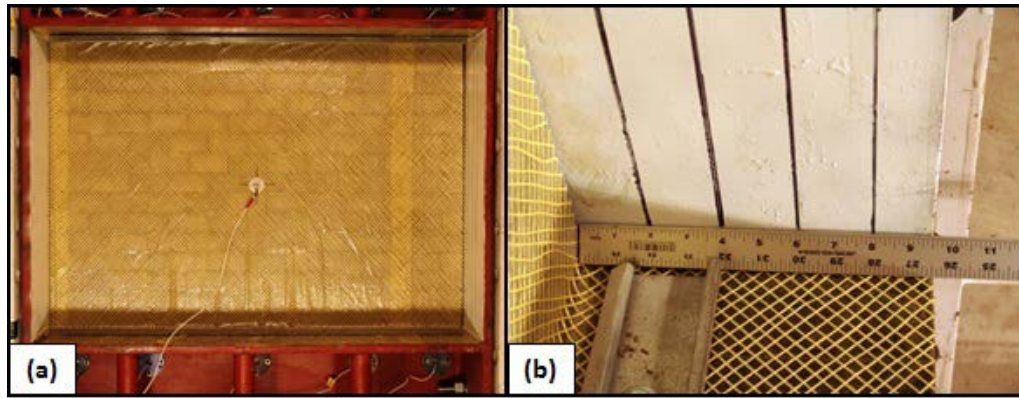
BLS8. (a) Pretest interior face of retrofitted wall. (b) Anchor plate deformed in a previous experiment bolted to test frame 1 in. behind wall.
